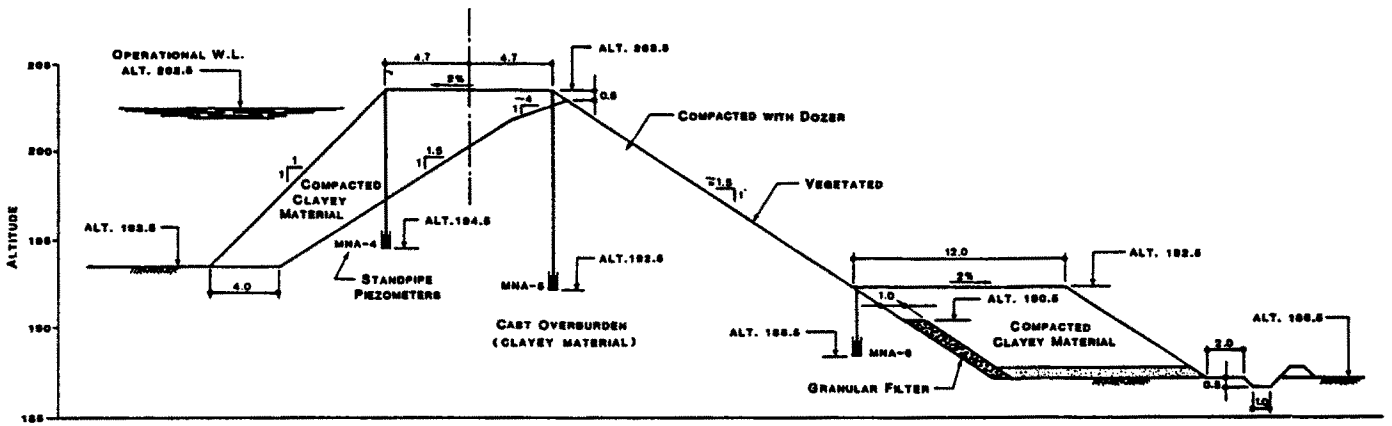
Typical Cross Section of the Initial Settling Area in the Mined-out Areas of Trombetas Bauxite Mine
